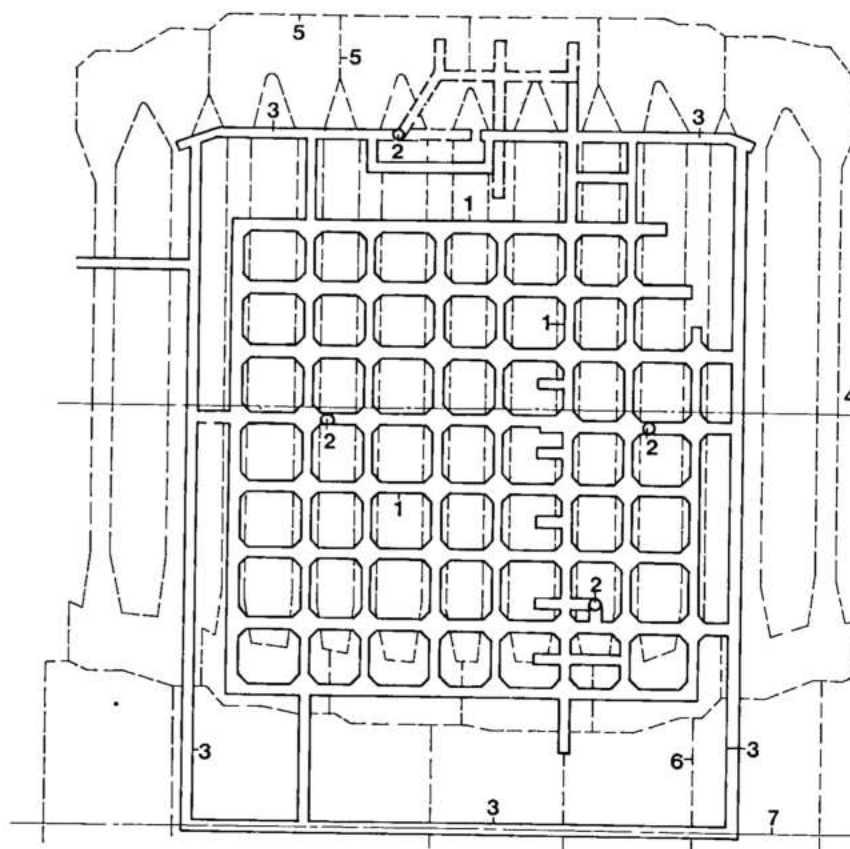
Main dam and powerhouse in the river channel foundation treatment - plan at El. 20
